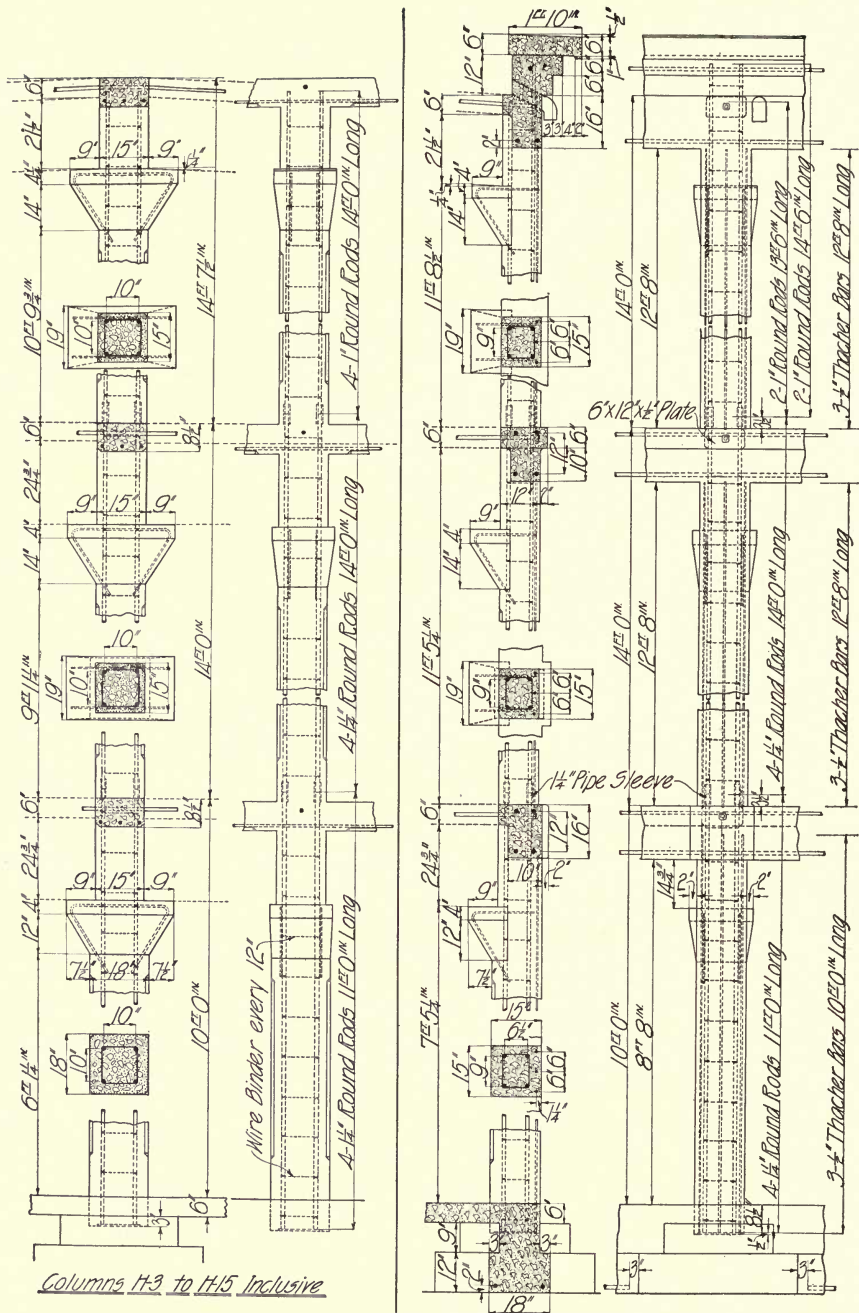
Details of Columns in Textile Machine Shop (See Fig. 78). (See p. 147.)
